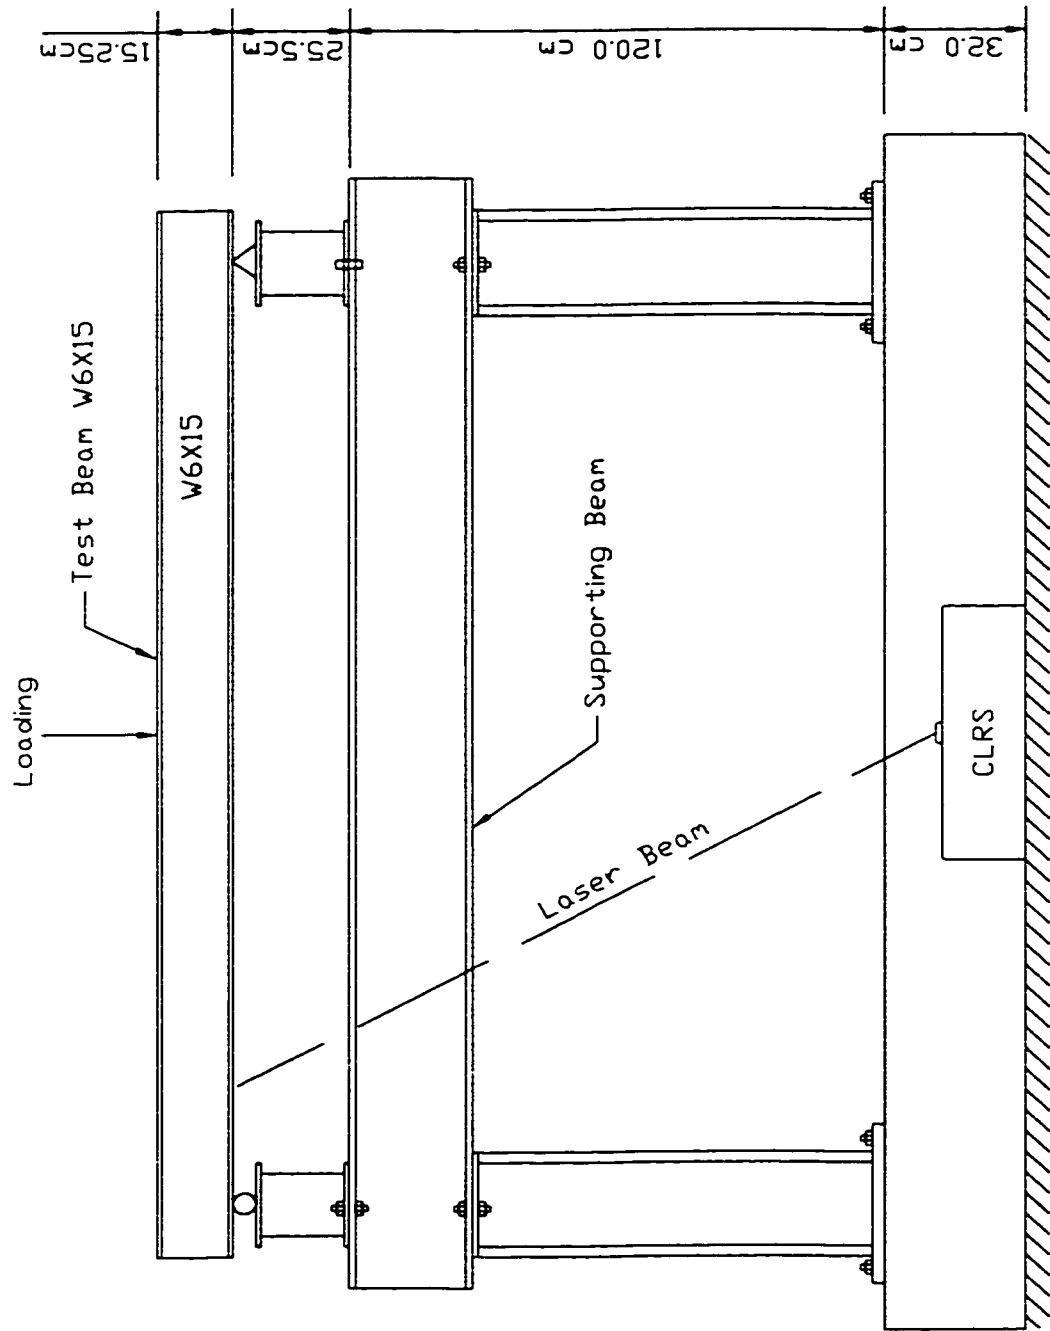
Model Structure Testing Setup Using CLRS (Elevation)
